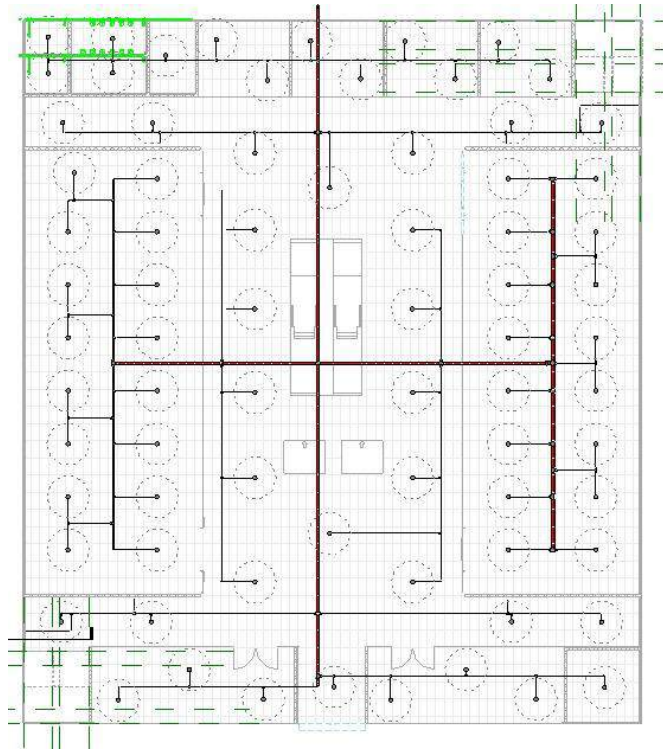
Plan of Ground Floor after placing Plumbing Fixtures
